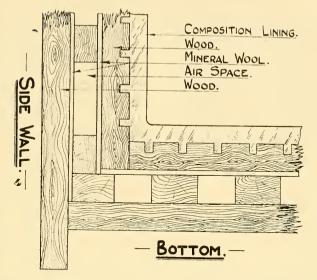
TYPICAL REFRIGERATOR WALL CONSTRUCTION
